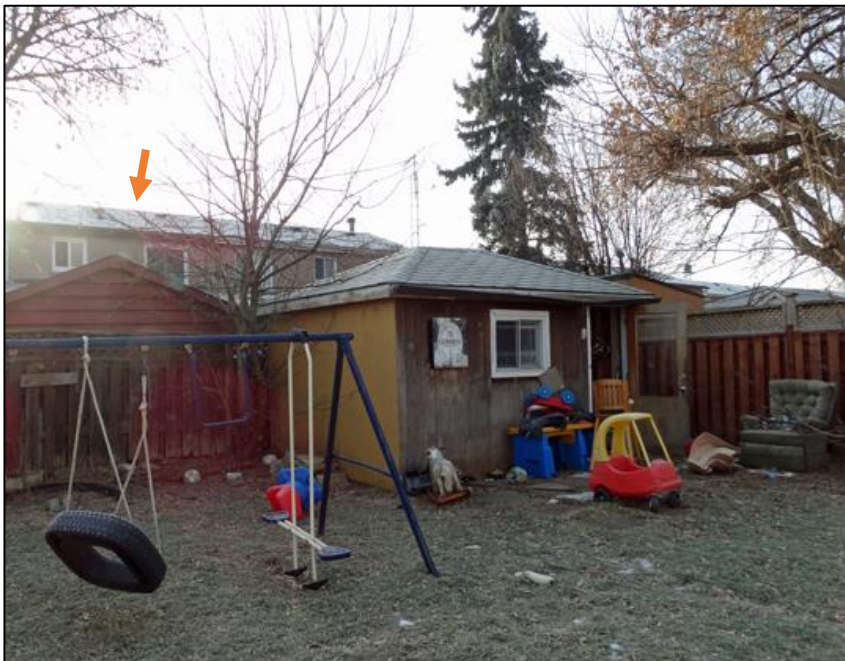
Outbuilding at rear of lot at 3064 Churchill Avenue, 2017. Note the two storey infill structure in the background
